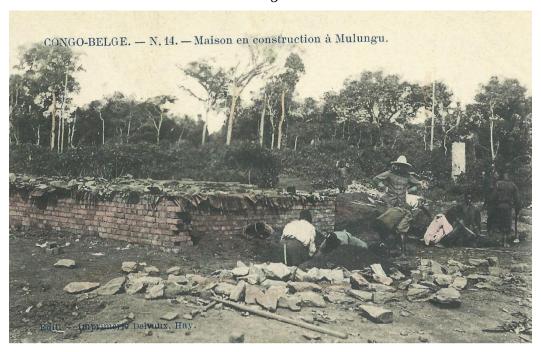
Unmailed colour postcard of a house under construction at Mulungu.
